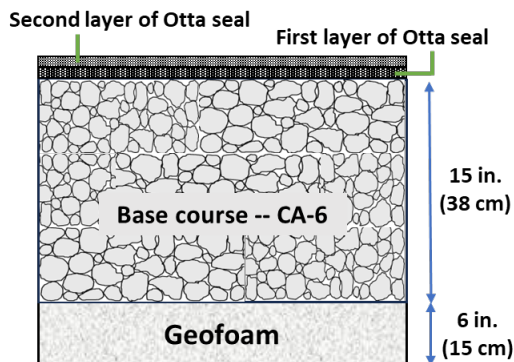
Illustration. Cross-sectional view of the box setup showing layer configuration.
